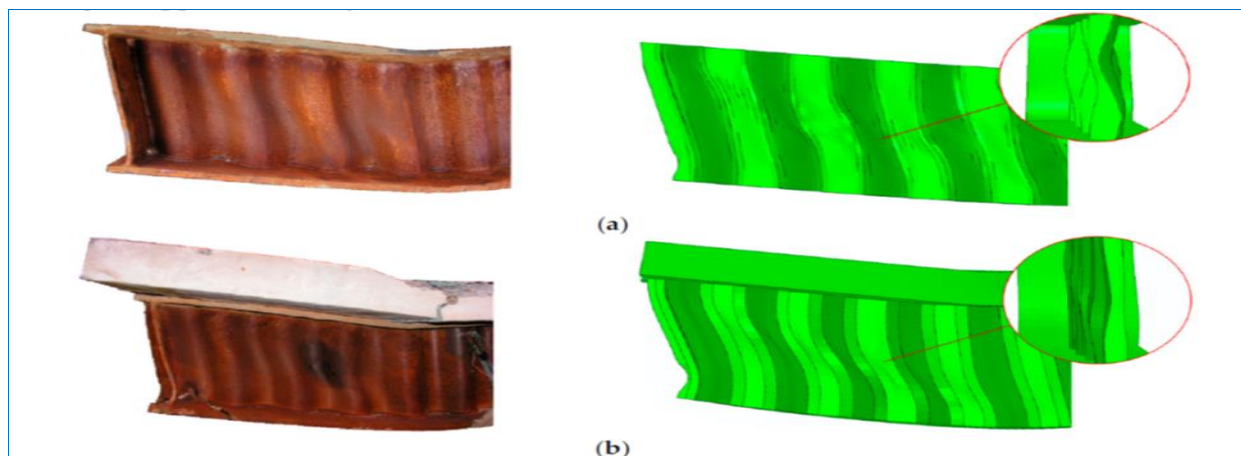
(a) steel girder; (b) the composite girder with a concrete slab.
